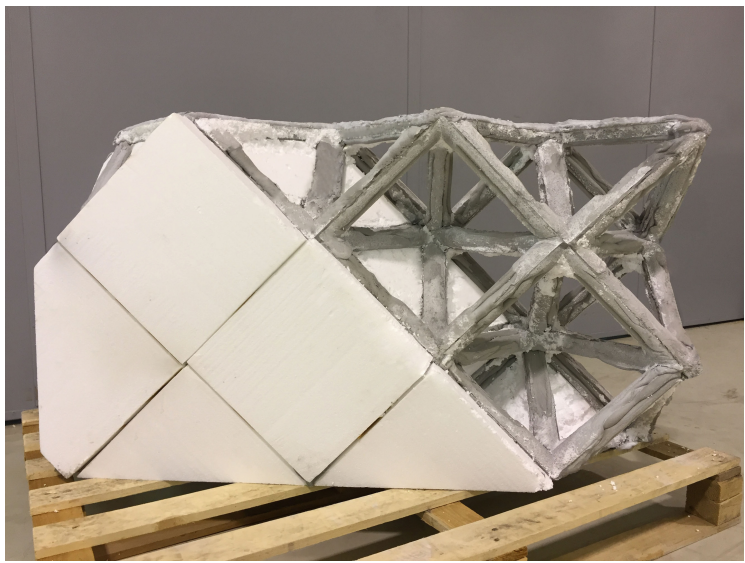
Space truss masonry wall with robotic extrusion, published in [5]
